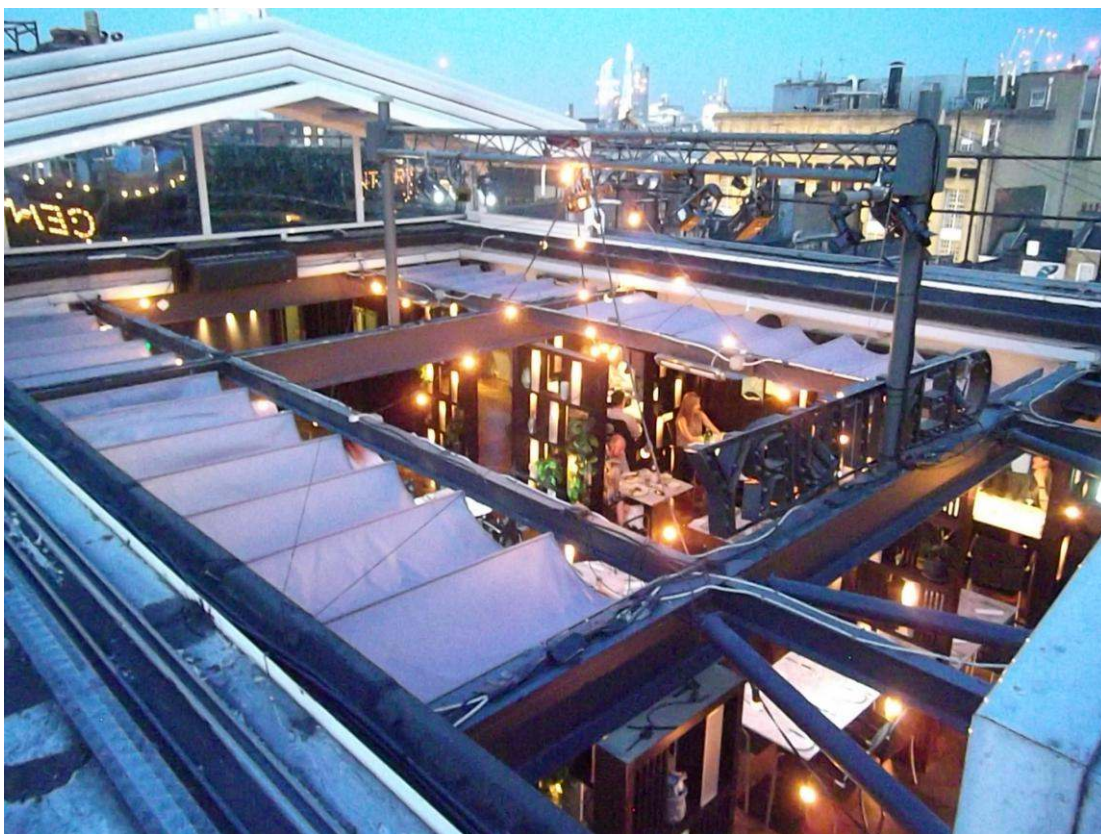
View into restaurant at level below roof level (i.e. entirely surrounded by walls)
